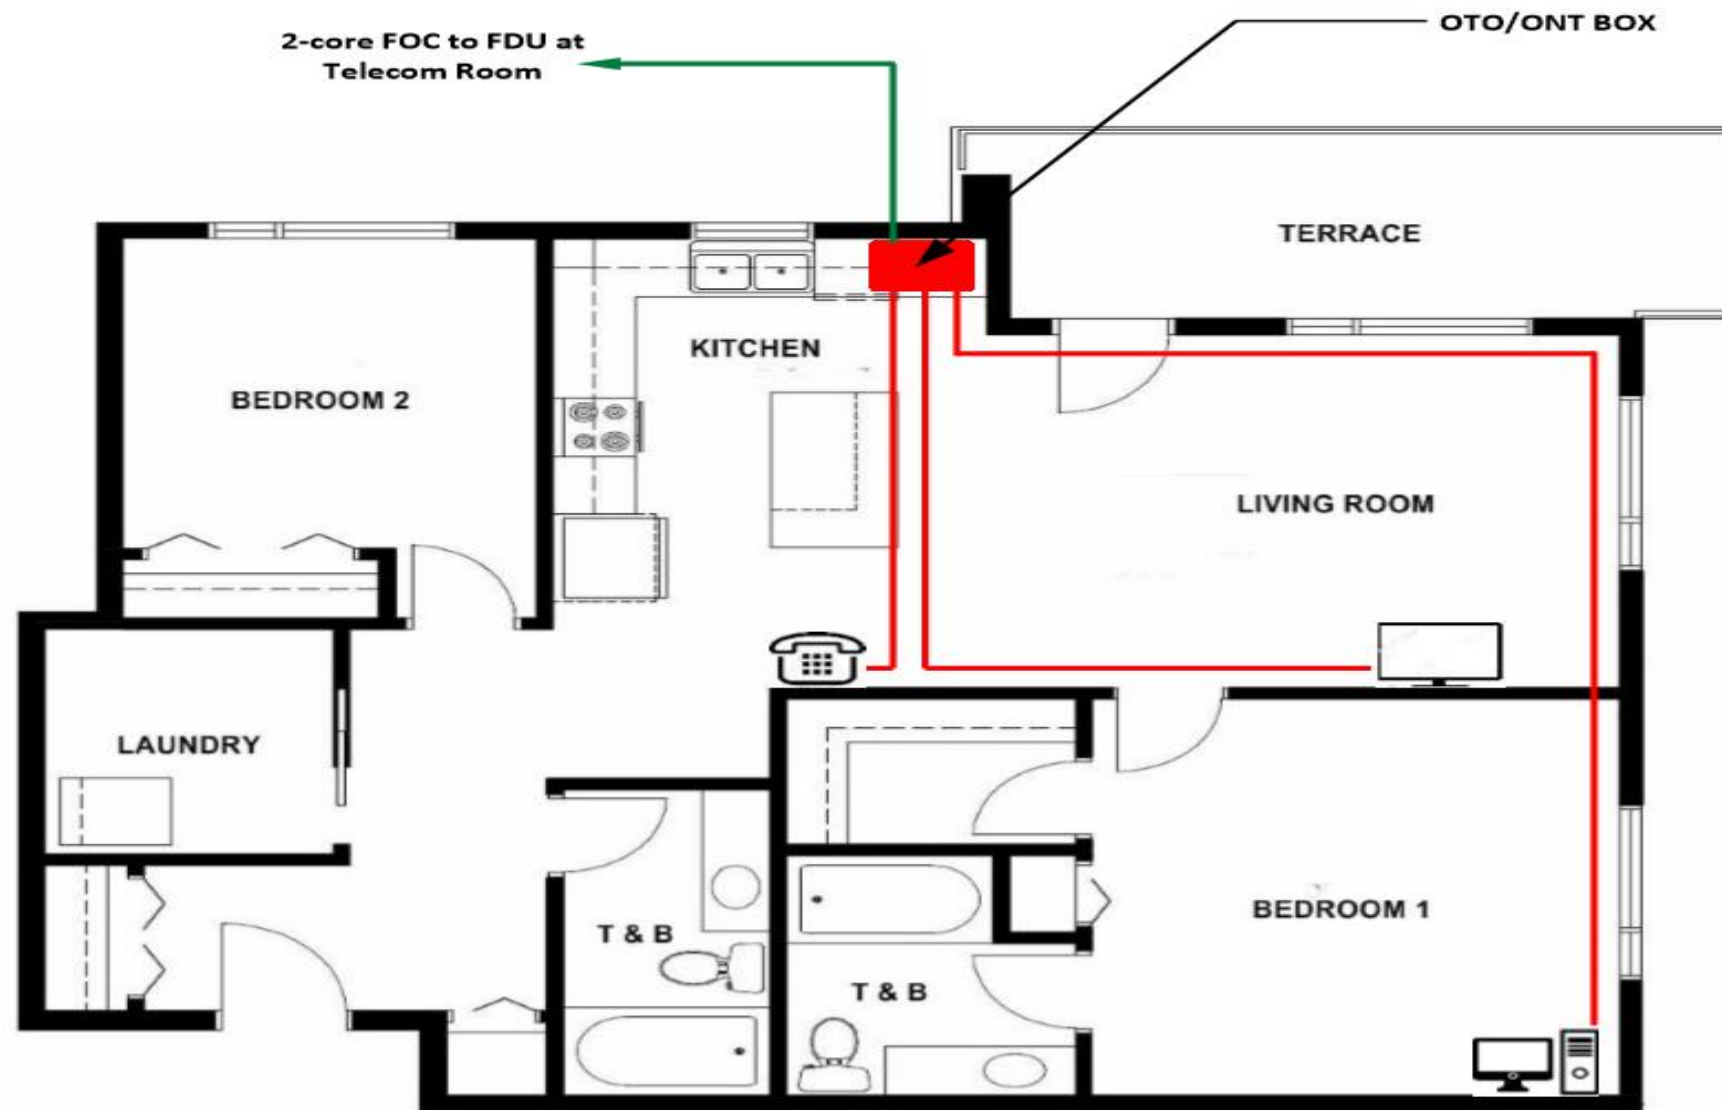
DETAILS OF OTO / ONT BOX ON TYPICAL GUEST ROOM
